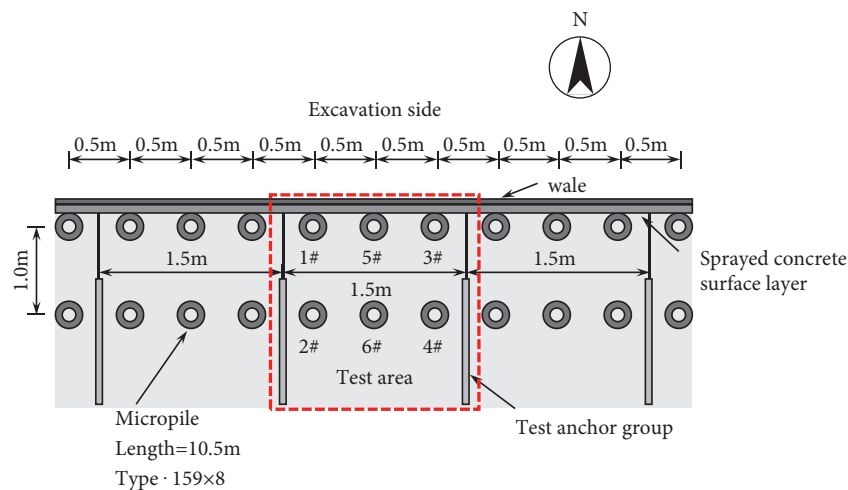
Layout plan of double row micropiles and anchors composite retaining structure test area.
